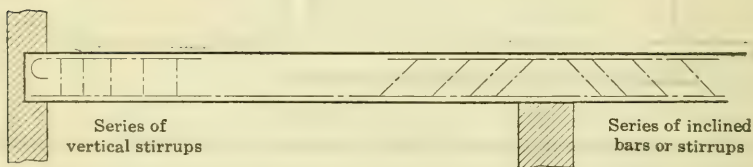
TYPICAL REINFORCED CONCRETE BEAM; WEB REINFORCED BY MEANS OF SERIES OF VERTICAL STIRRUPS, OR SERIES OF INCLINED BARS OR STIRRUPS.
